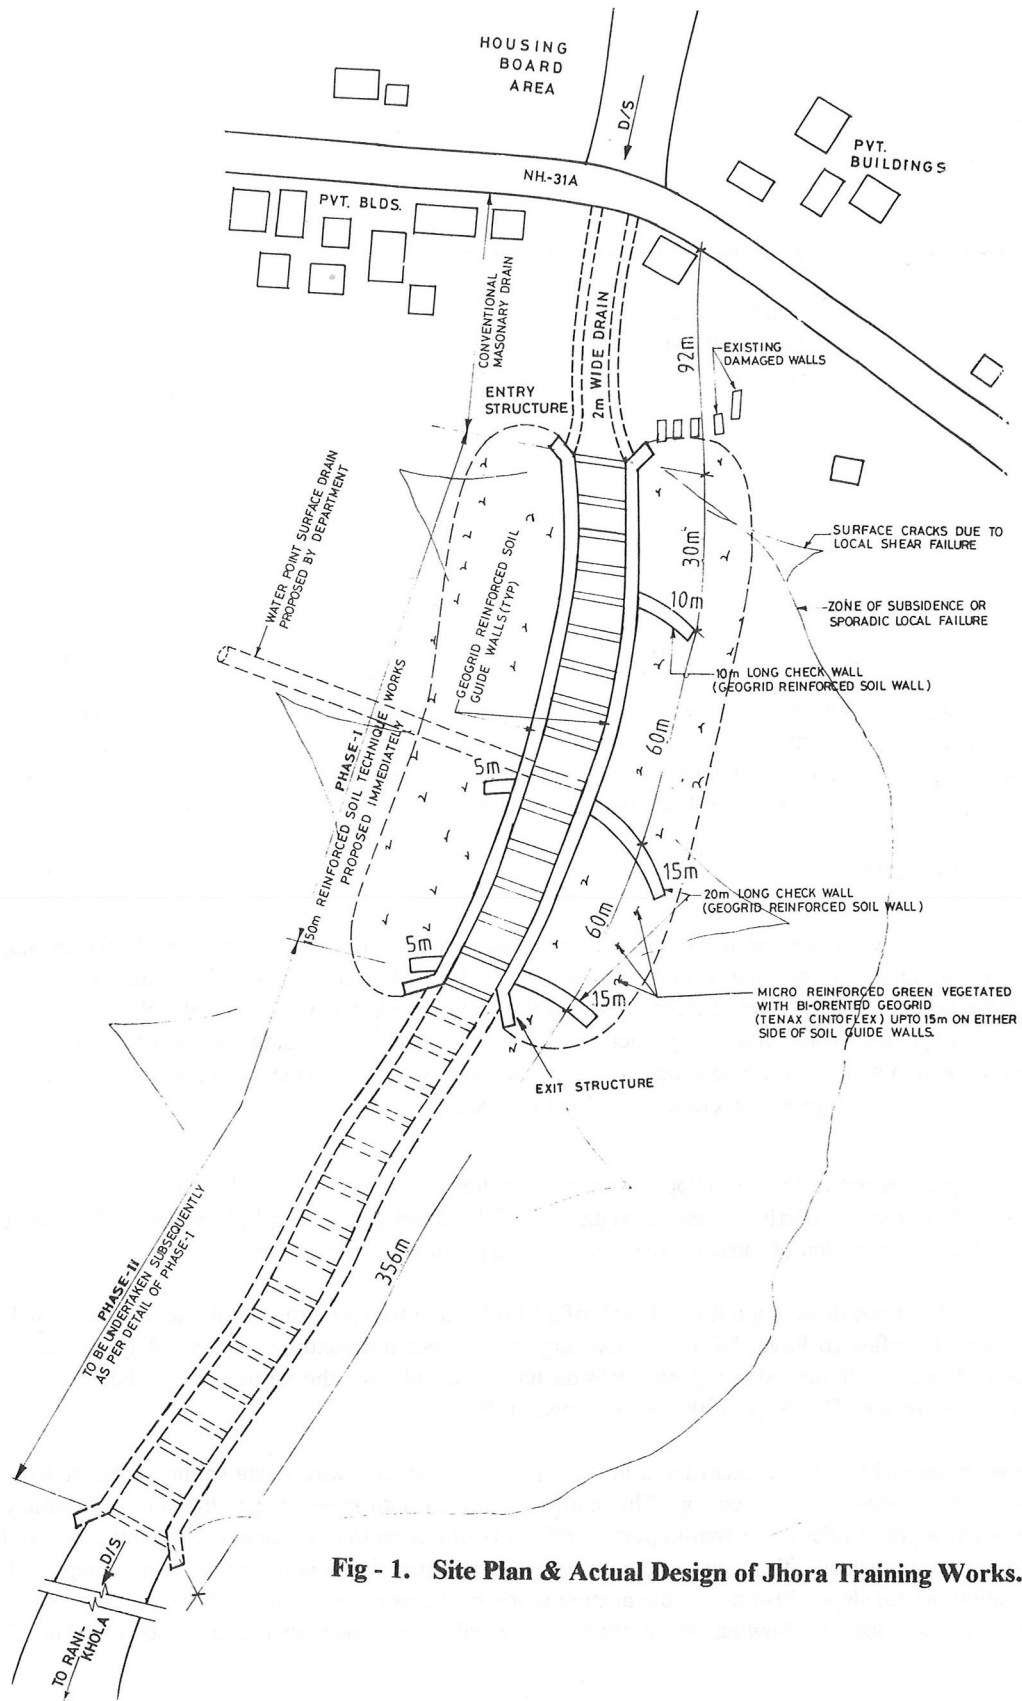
Site Plan & Actual Design of Jhora Training Works.
